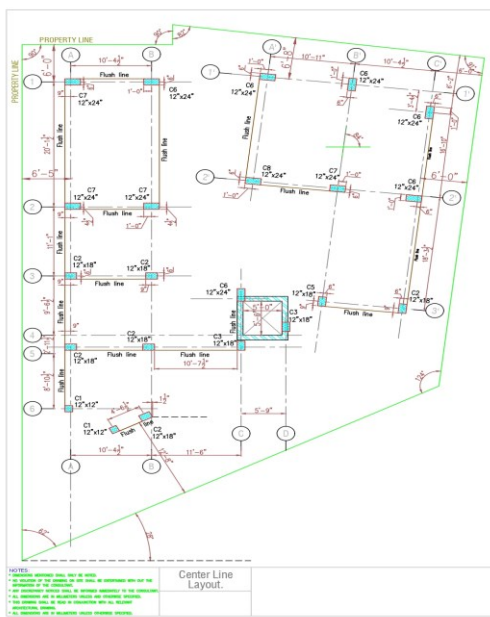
The Center-Line Layout plan of the Conceptual Columns.
